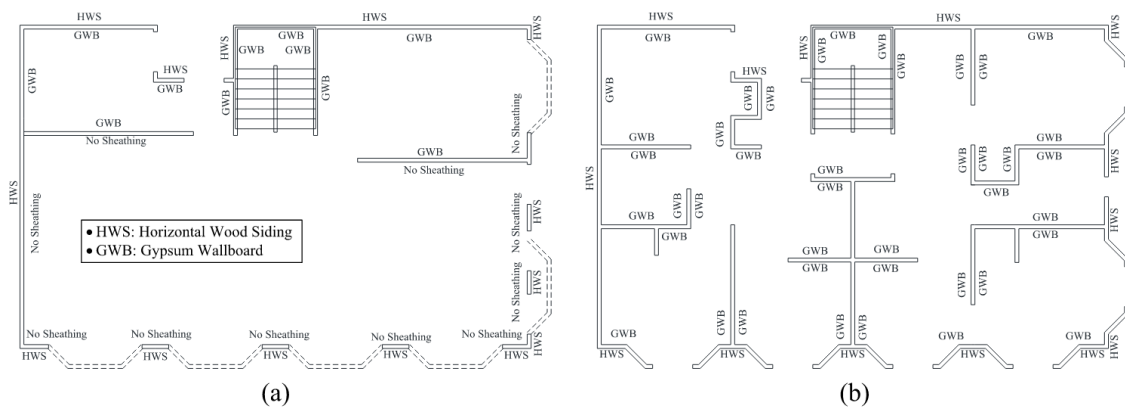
Existing wall sheathing in the original building [4]: (a) First Story; (b) Upper Stories
